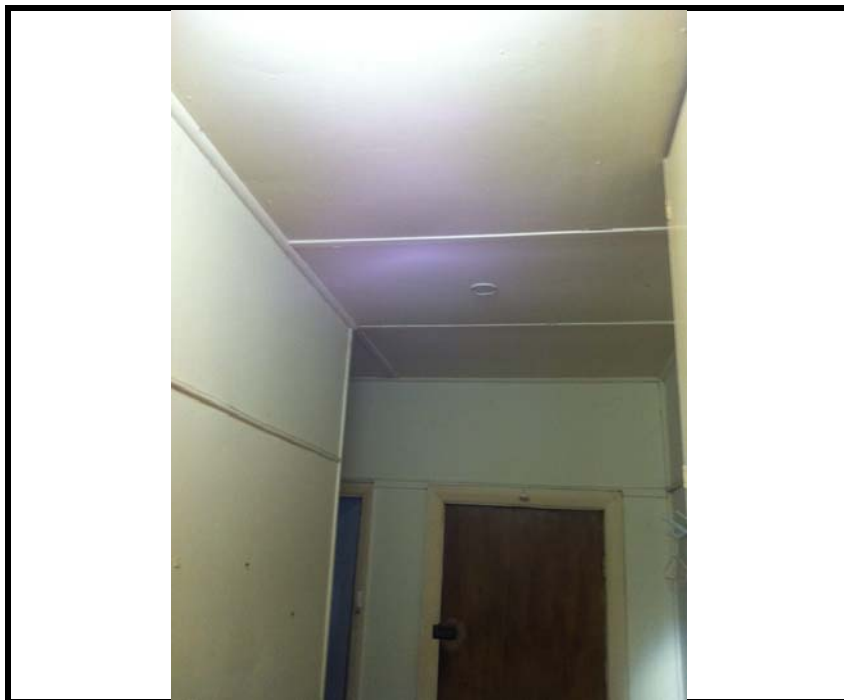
8 Bowditch Avenue - Example of AC sheeting lining to wall in front (western) room to the house
